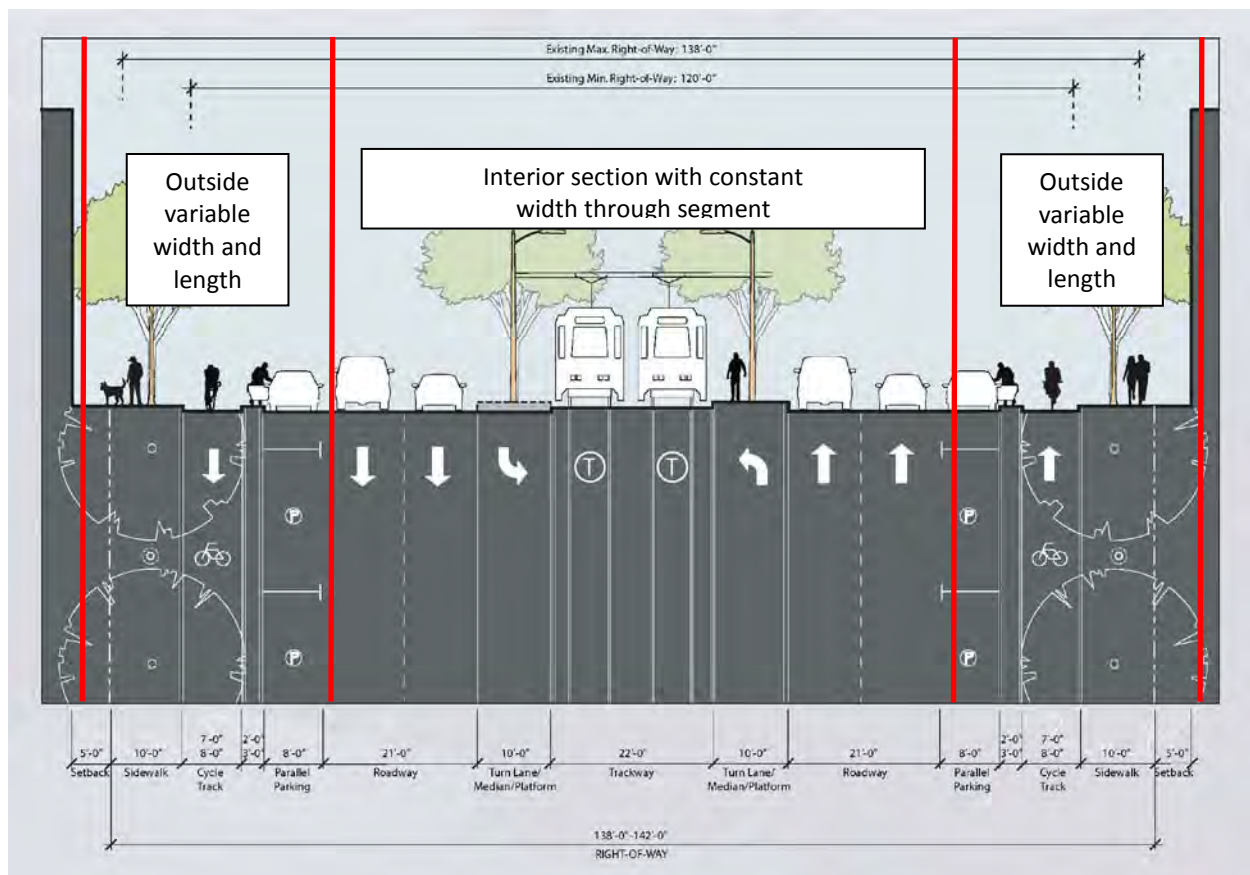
Four-lane Typical Section with Parking (Segments 1, 2 and 3)
